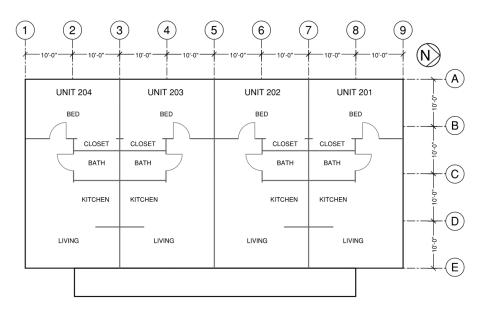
Second-story plan of the design example short-side-open building, where the third story is similar.
